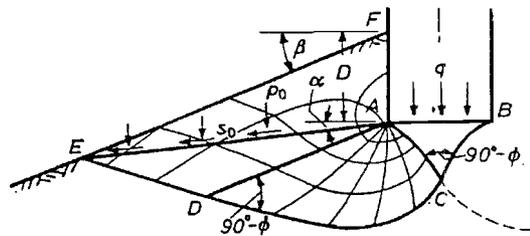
Plastic zones near rough strip foundation on face of slope (foundation failure)
